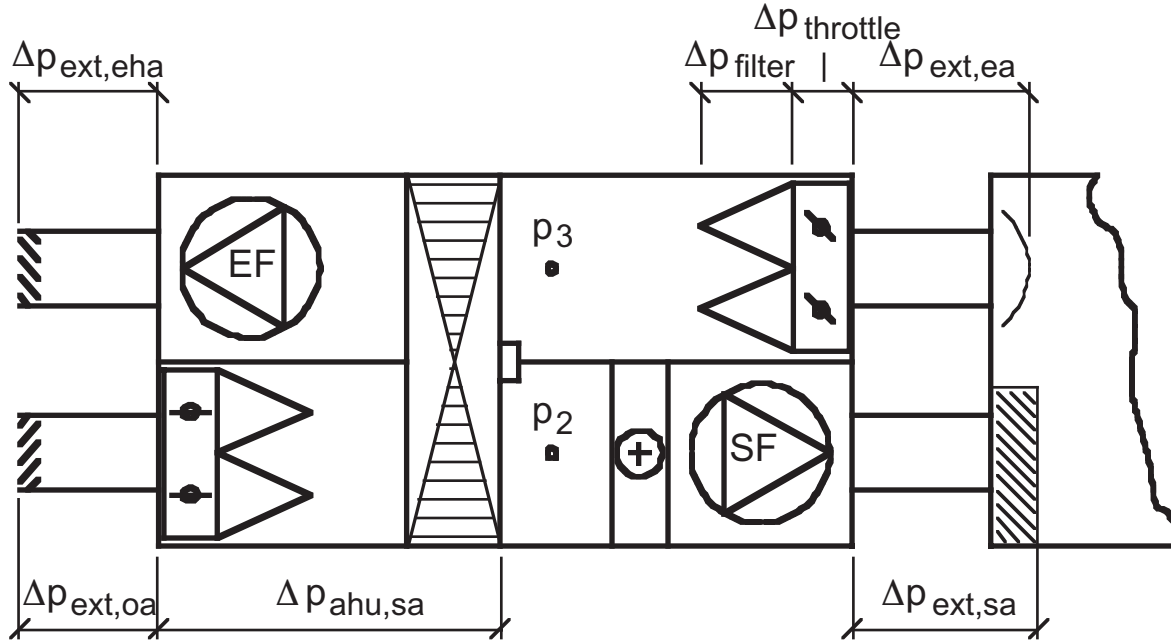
Air handling unit with rotary heat exchanger and extra throttling
